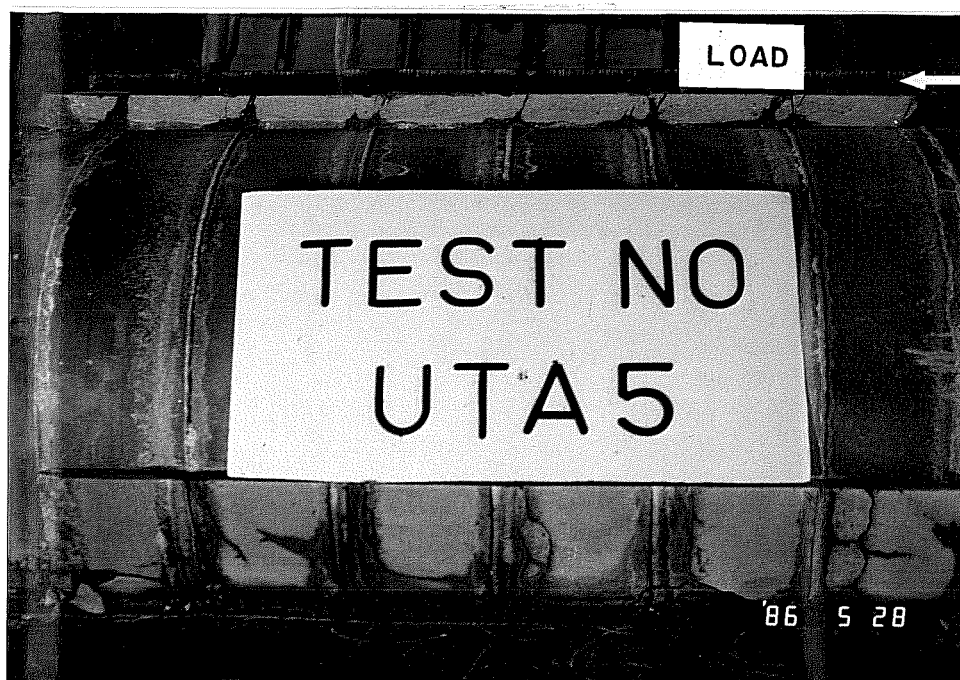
Grout profile of Specimen UTA5 showing crack pattern
